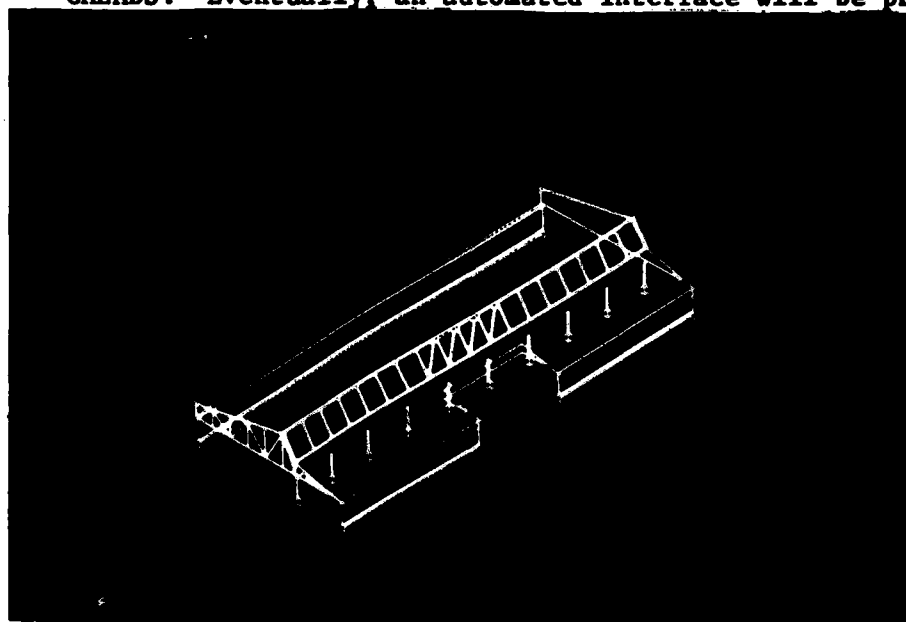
Conflicts in placement of components can be detected, e.g., the girder and roof.
